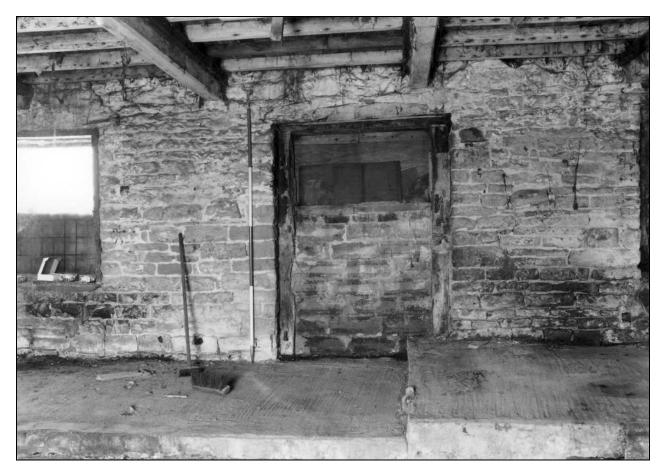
Building 1a: internal view of blocked doorway in west side of ground floor (film 3, frame 16)
